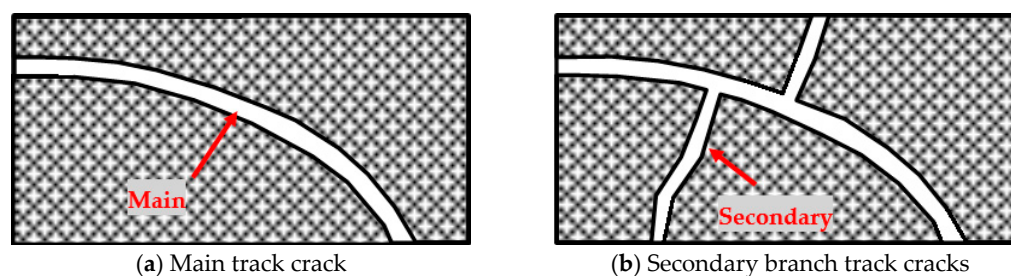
Types of cracks proposed in this study: (a) main track cracks and (b) secondary branch track cracks.
